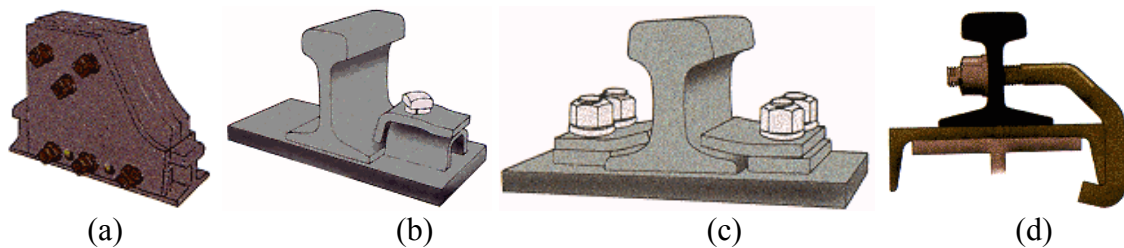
Accessory components for a typical crane runway beam: (a) crane end stop, (b) single hole clamp and holder, (c) double clamp and (d) hook bolts.
